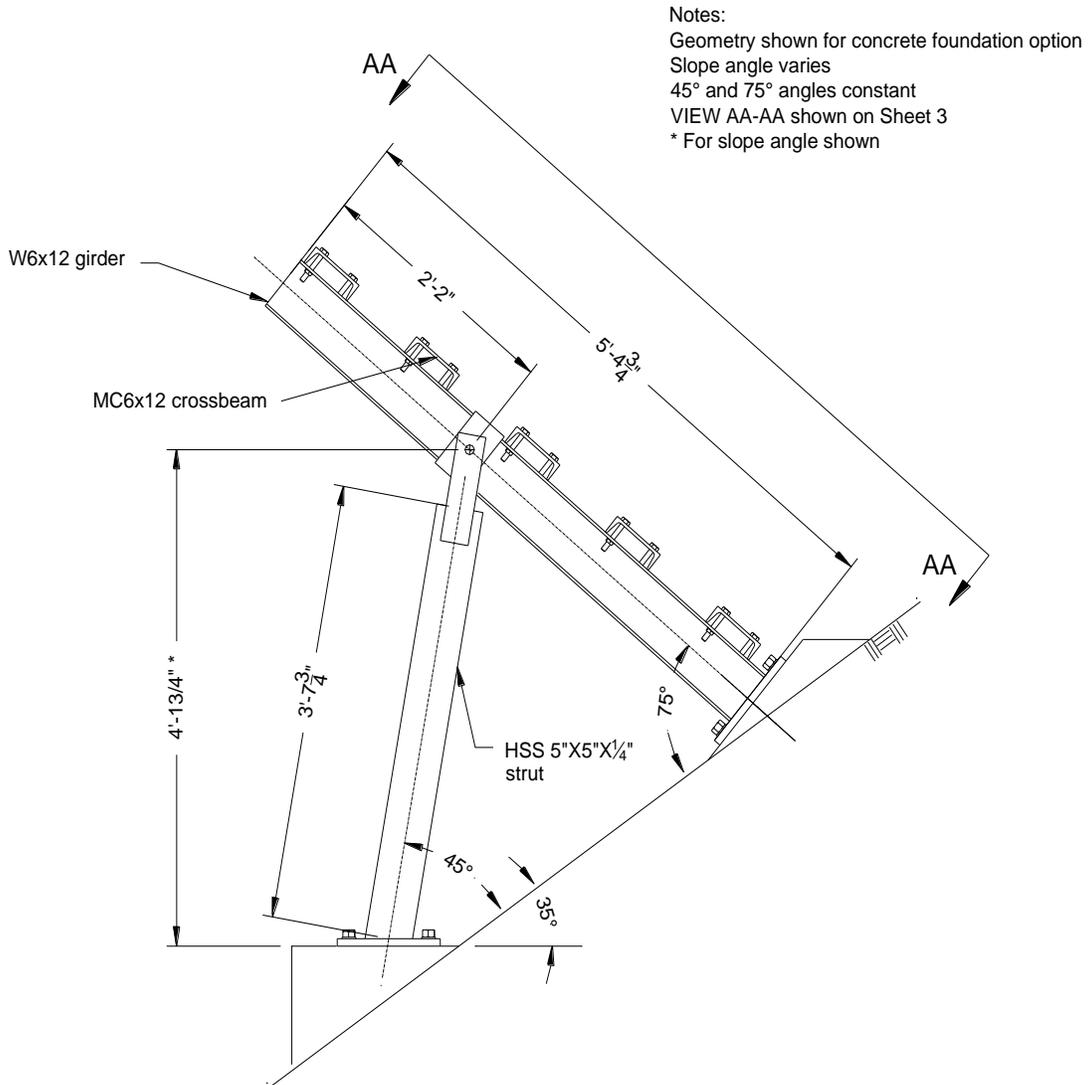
Side elevation view of snow supporting structure on CIP concrete footings
